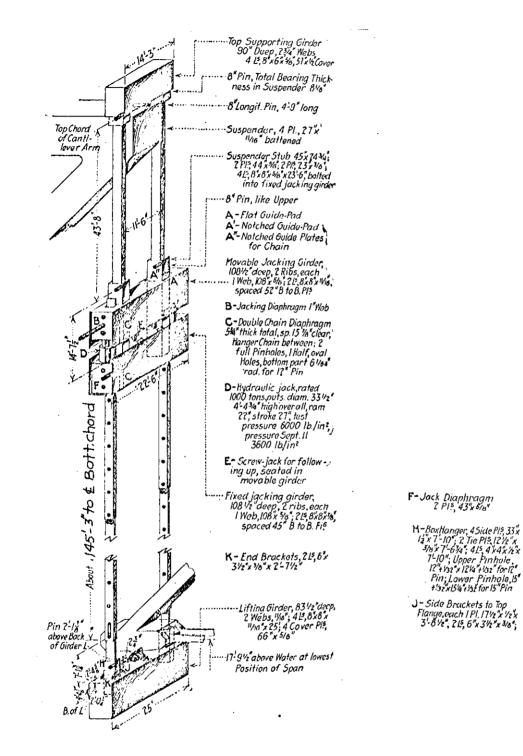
Diagram of hanger used for hoisting suspended span of the Second Quebec Bridge (12)
